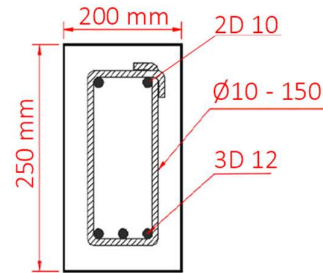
Cross-sections of the reinforced concrete beams (Abdulrahman & Kadir, 2022).
